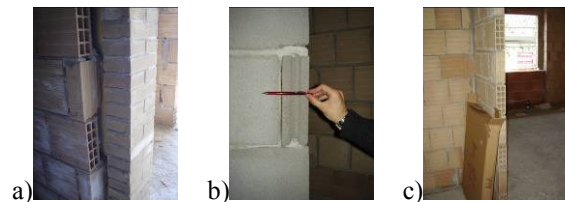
External walls (a), concrete blocks (b), internal partitions (c)
